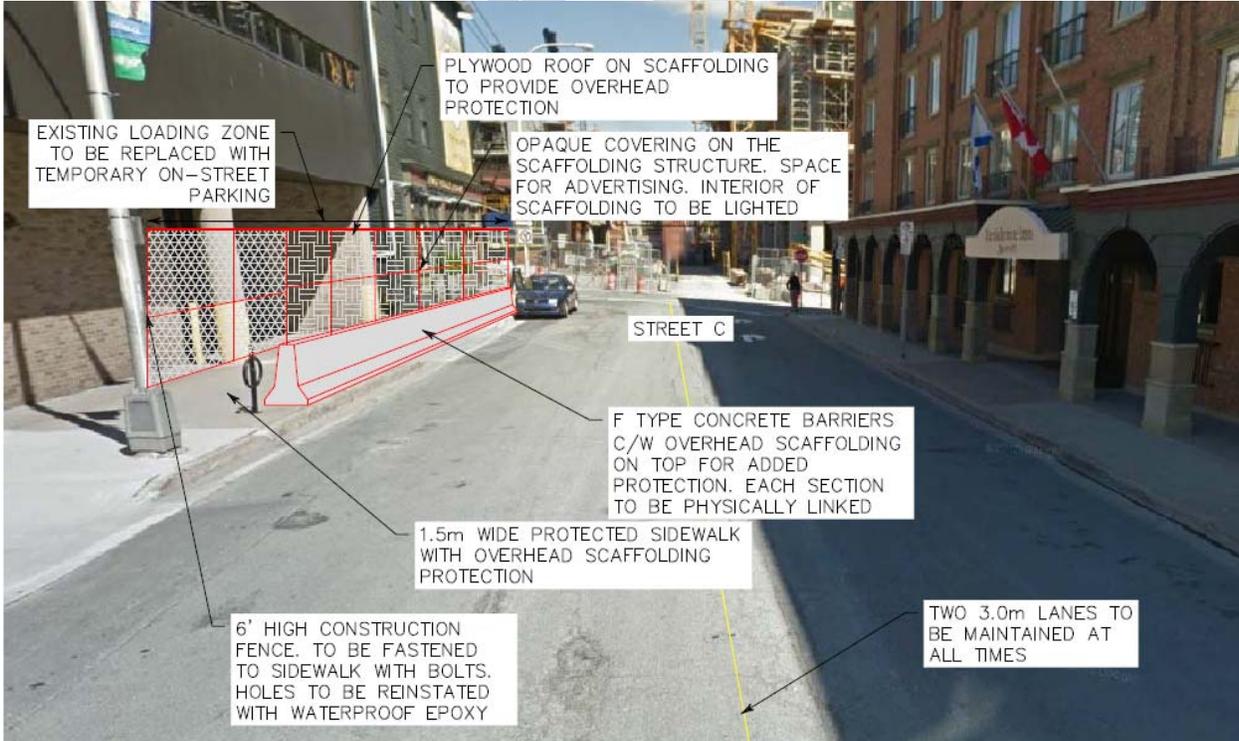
Proposed walk-through scaffolding; Street C. This sidewalk will remain untouched during construction, however considering the proximity to the active work site, it will be necessary to include the walk-through scaffolding for added pedestrian protection.
